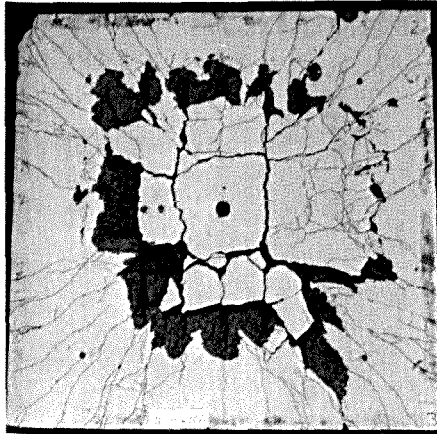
Posttest photographs of Specimen D4075-1 (Sheet 1 of 2).
